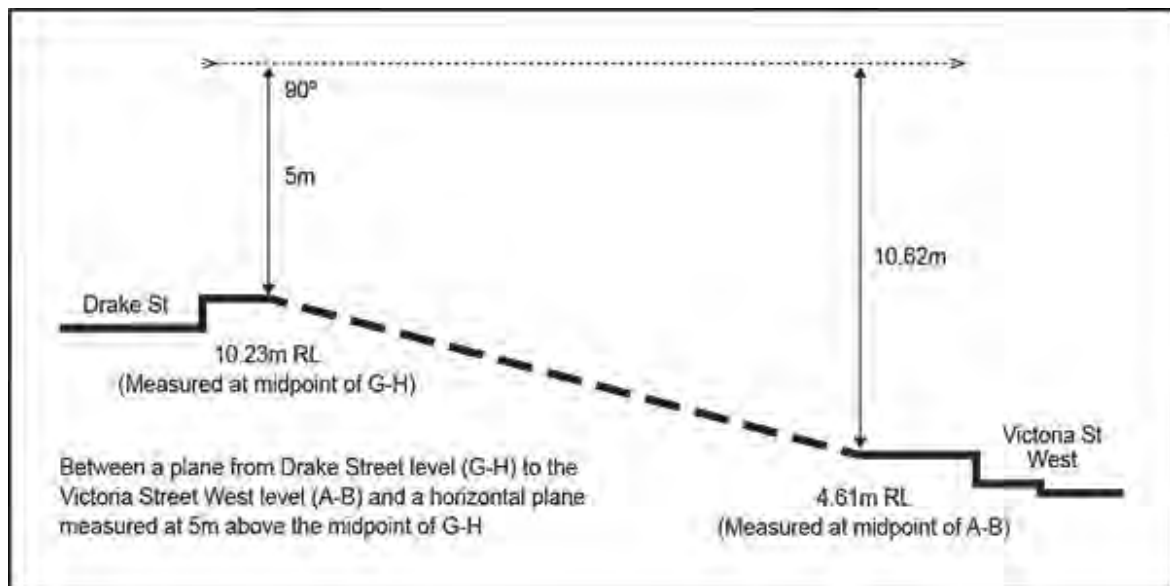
Adelaide Street viewshaft elevation
